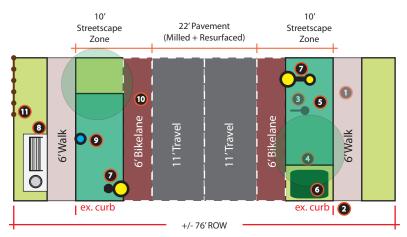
Kercheval Greenway Plan-Section: Full Level of Development
